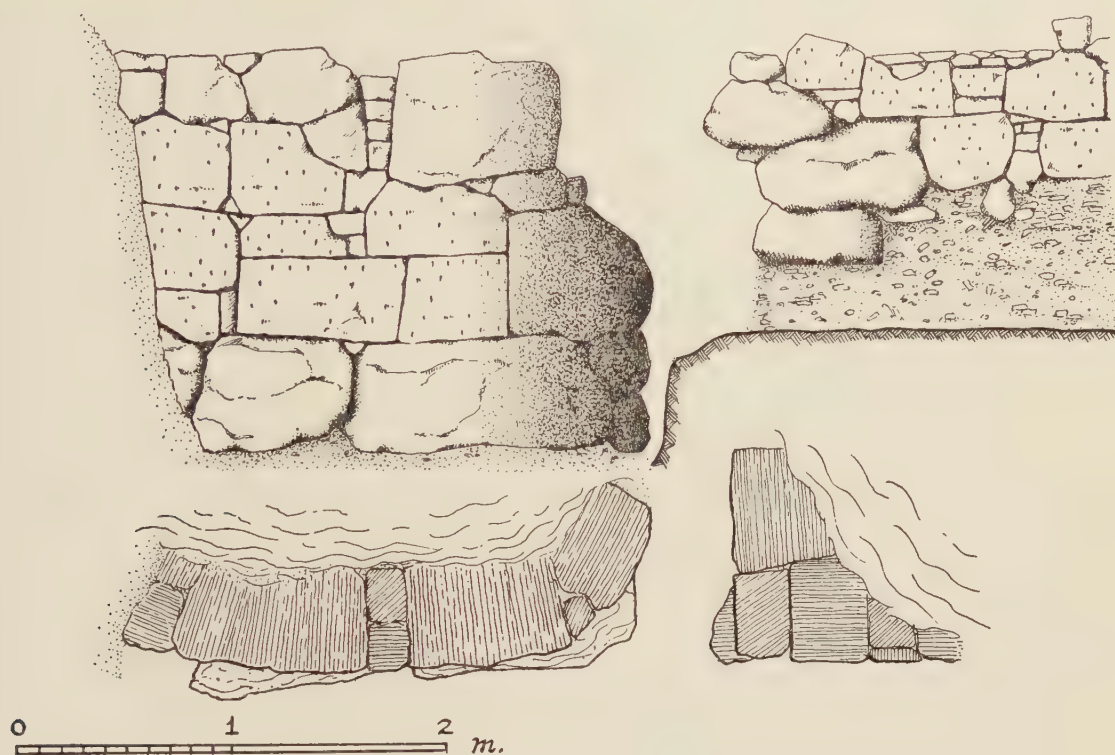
East Wall of Drain at Entrance of Side Drain: Elevation and Plan.
